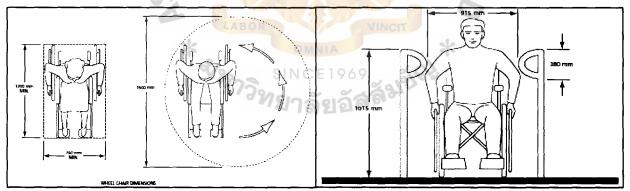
WHEELCHAIR DIMENSION
